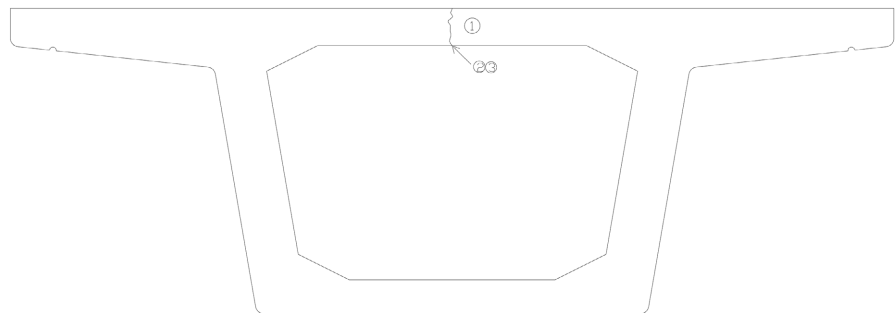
Diagram of side crack at the end of the top slab of left box girder DY42-DY43.
